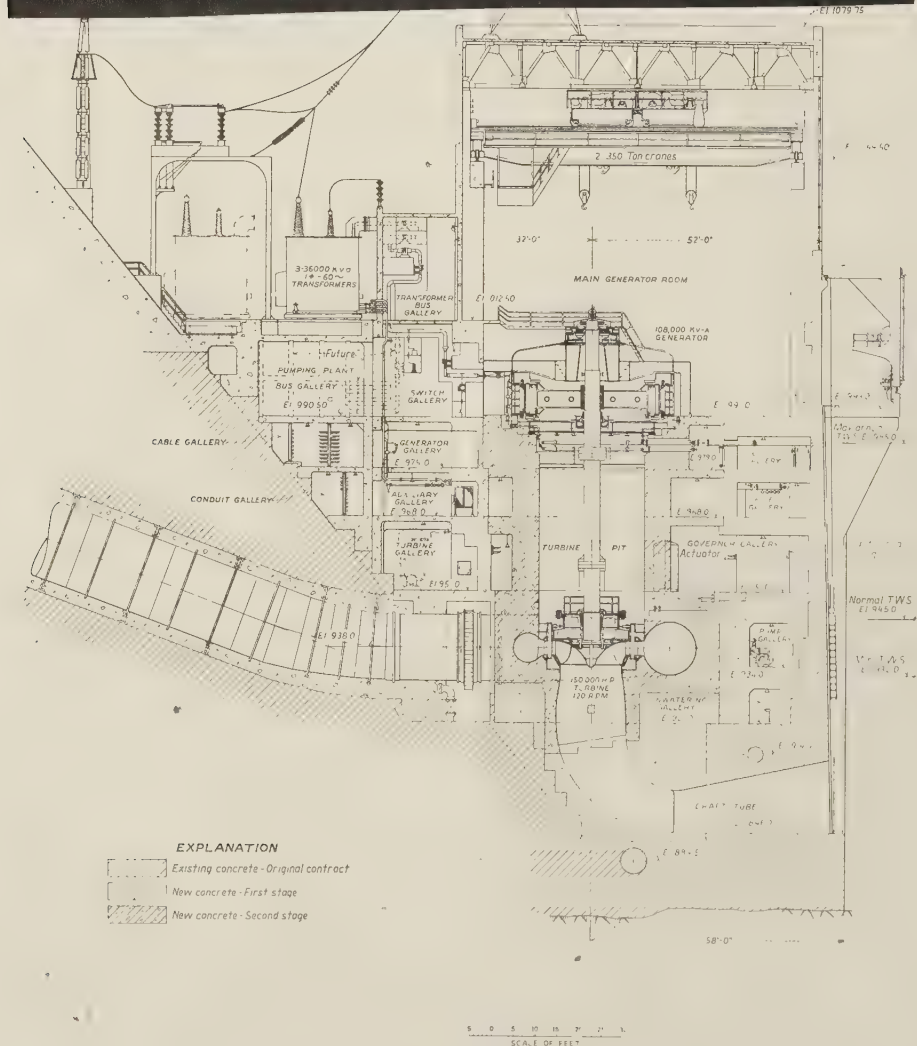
TYPICAL CROSS SECTION THROUGH THE POWER PLANT
